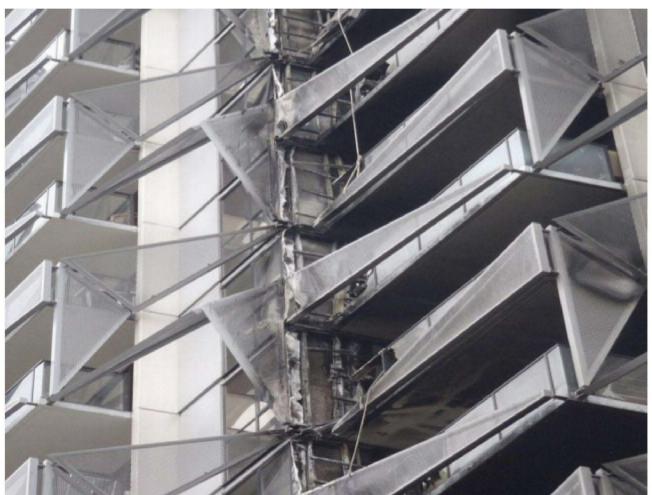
Fire damage to the external wall cladding and ornamental structures
